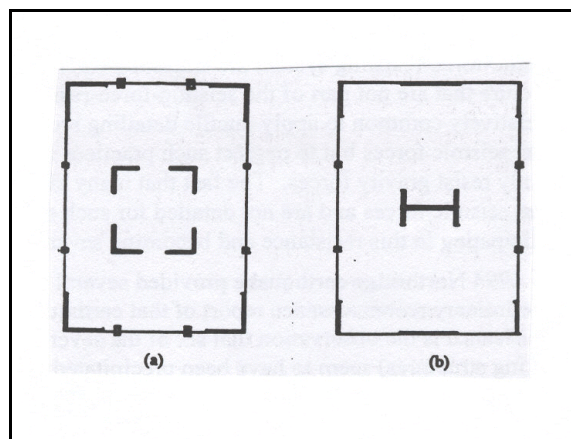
Arrangement of shear walls and braced frames – recommended. Note that the heavy lines indicate shear walls and/or braced frames.
